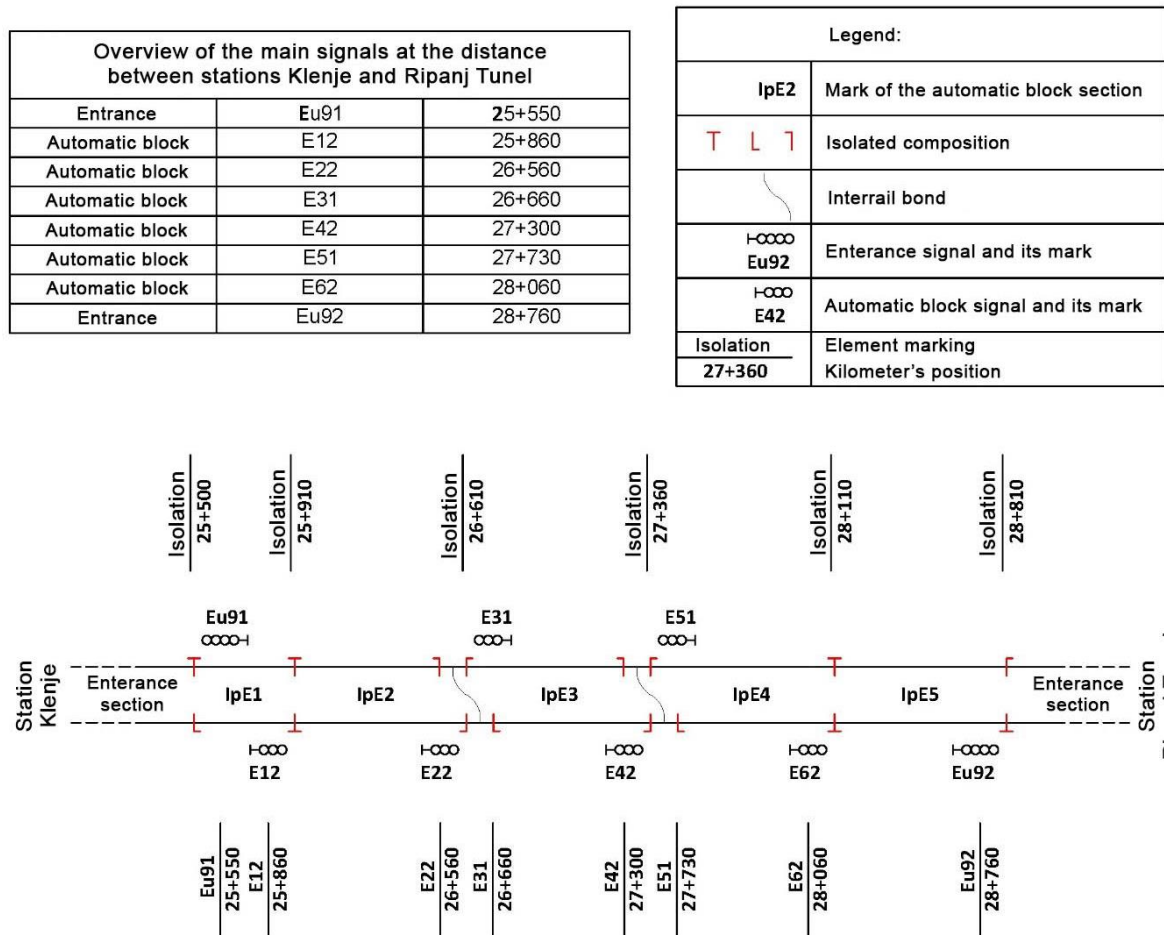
Sketch of arrangement of automatic block sections and signals at distance between stations Klenje - Ripanj tunnel
